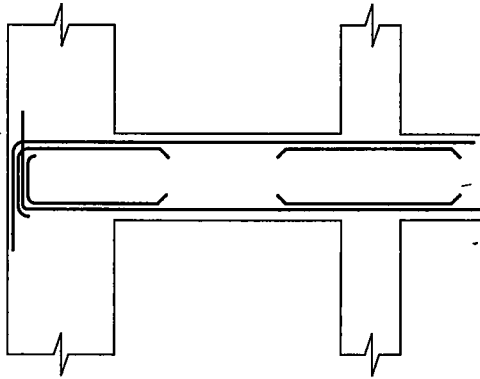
Longitudinal reinforcement at the joints in a beam
